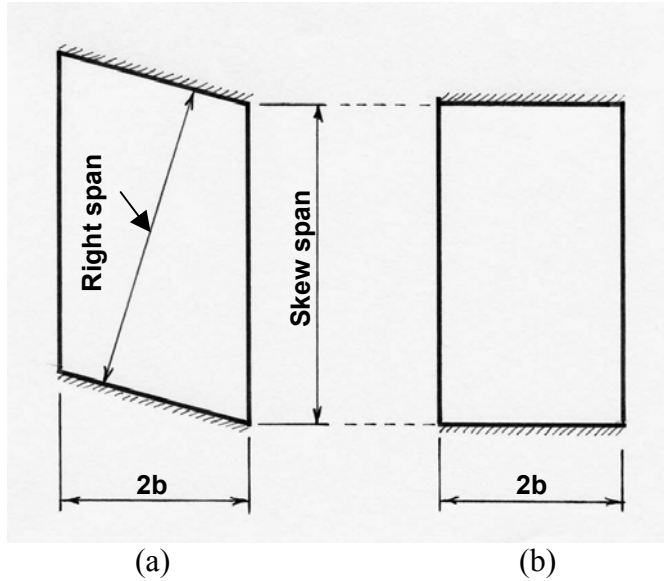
Analysing skew bridge as right: (a) skew bridge; (b) equivalent right bridge
